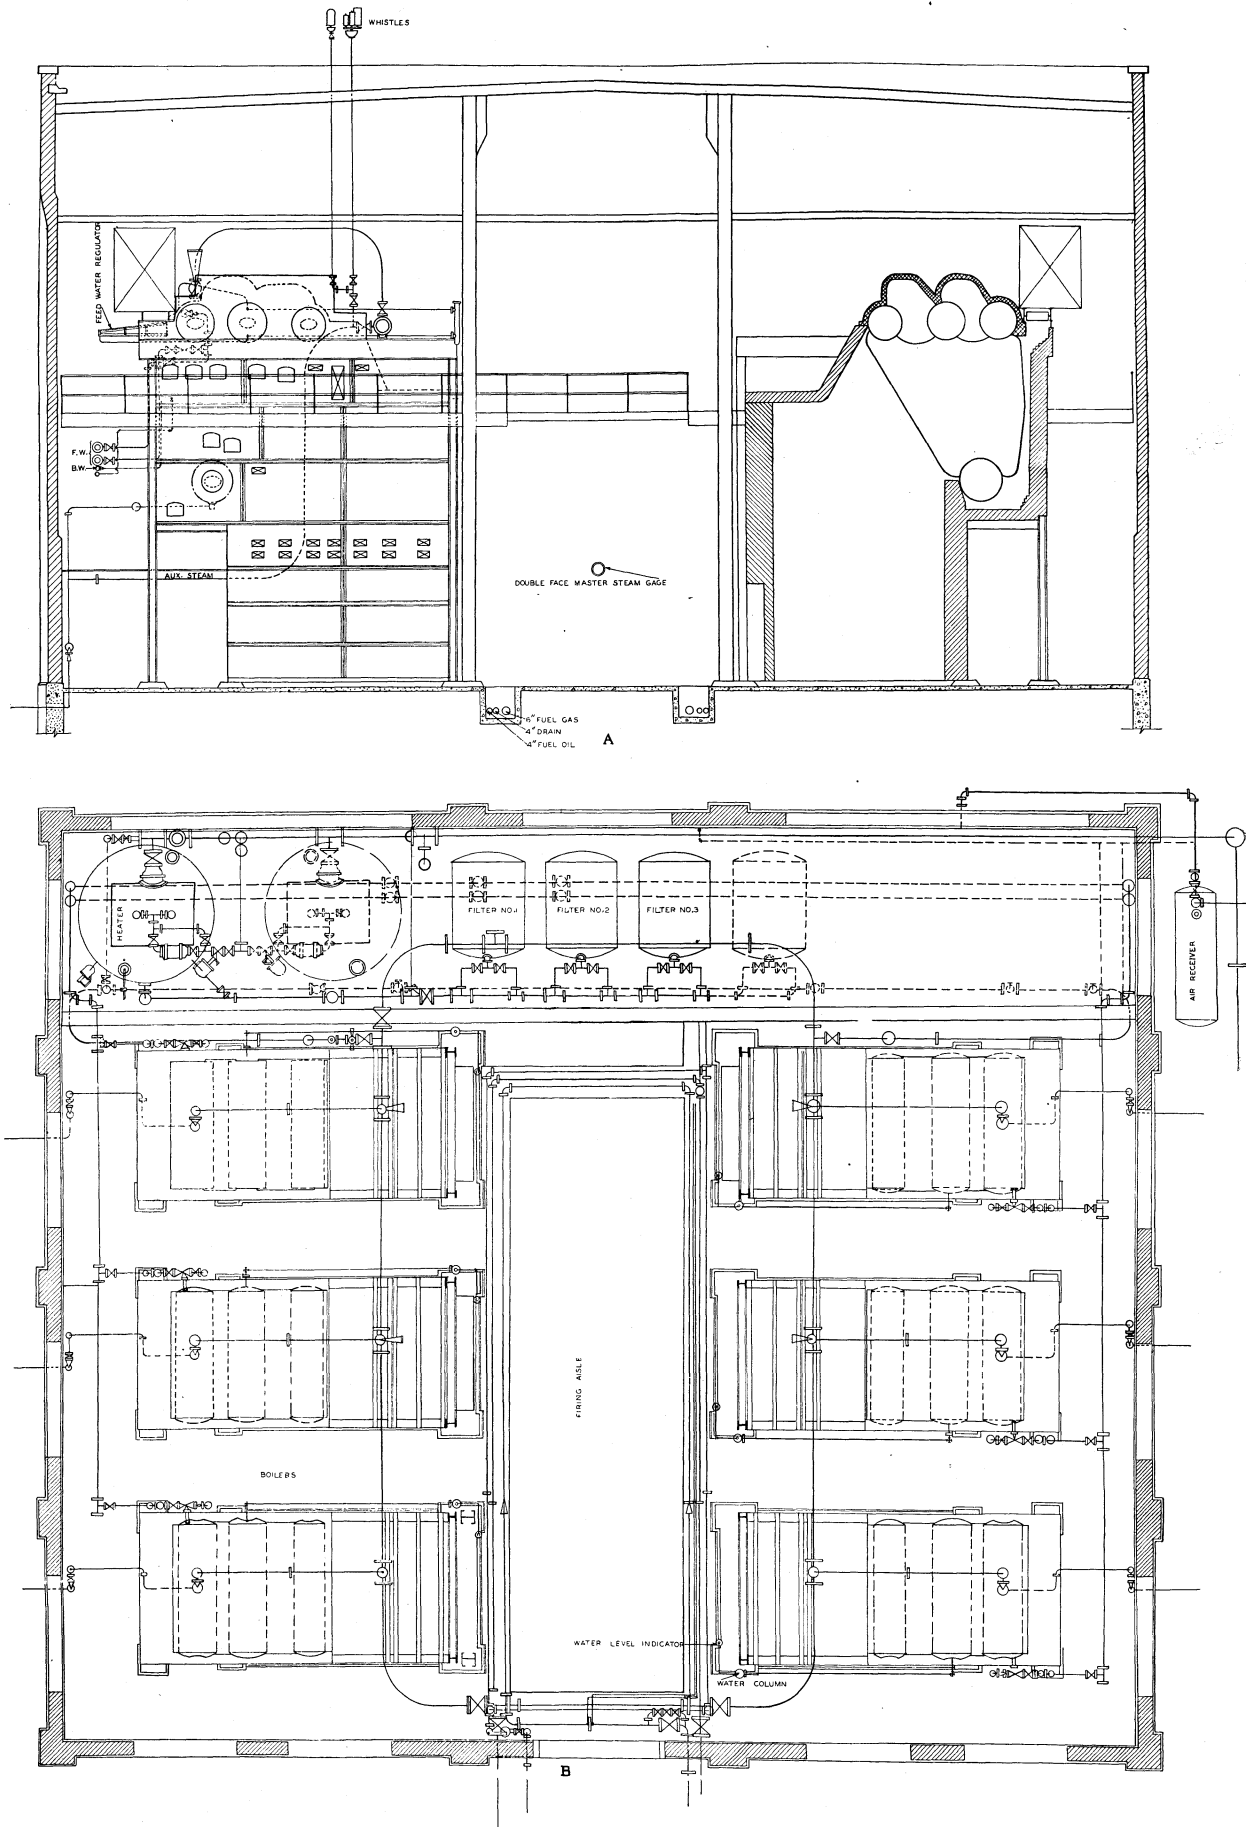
ELEVATION AND PLAN OF THE PLANT
